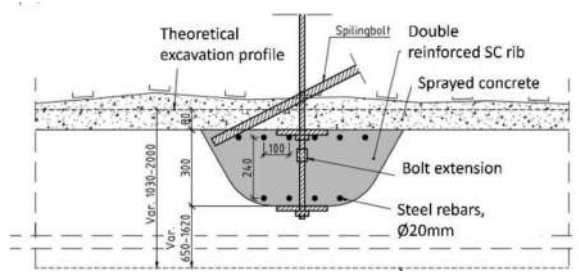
Design of RRS2 for temporary rock support The ribs are constructed around the whole tunnel cross-section including the floor.
